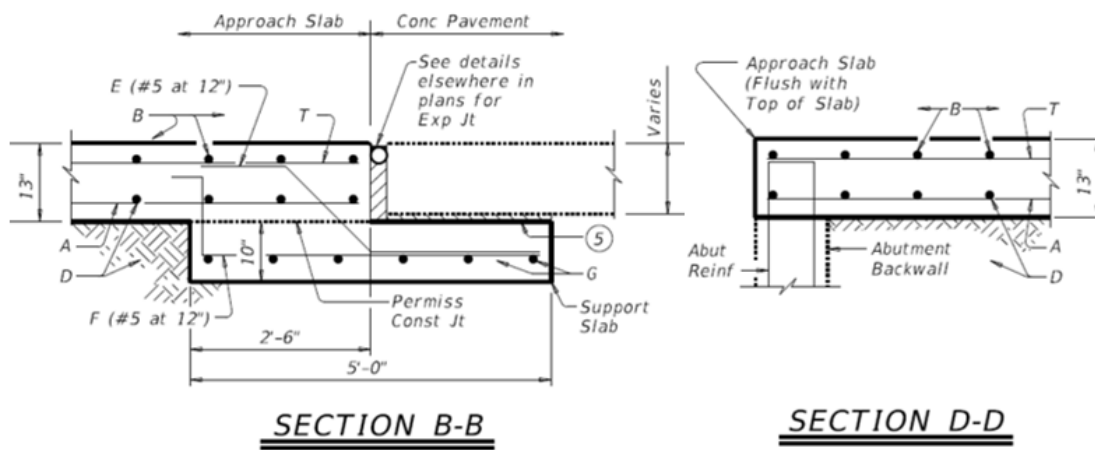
Texas DOT Approach Slab Details: Section B-B Approach Slab/Approach Pavement Interface, Section D-D Abutment/Approach Slab Interface
